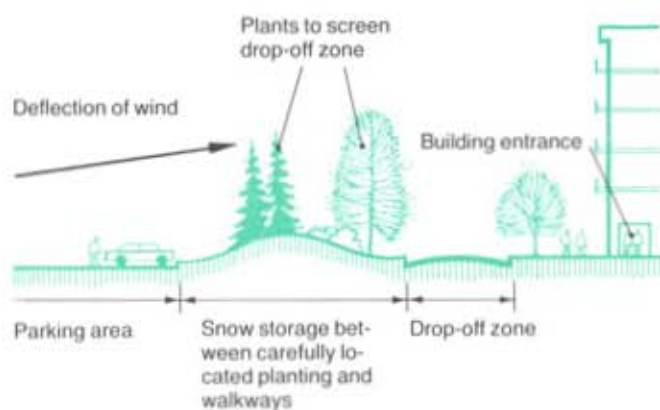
An example of a snow storage area between a parking lot and a drop-off zone at a building entrance.
